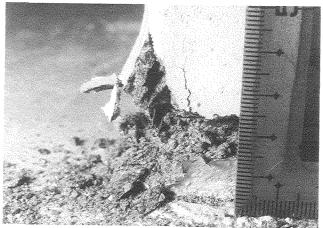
Cracks of Center Column st First Story (Reinforcing bars buckled and broke off)
